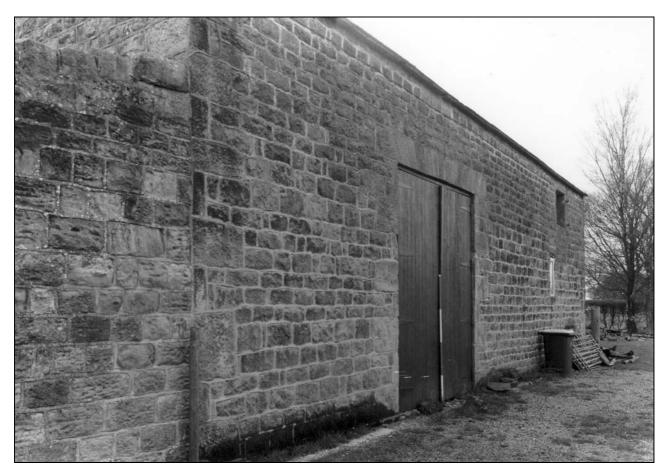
Rear, south-east elevation of the barn (film 2, frame 2)
